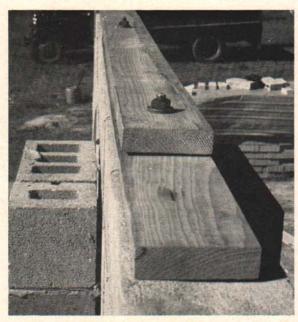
Wooden plate in place on top of concrete masonry wall, anchored by 1/2-inch bolts.
